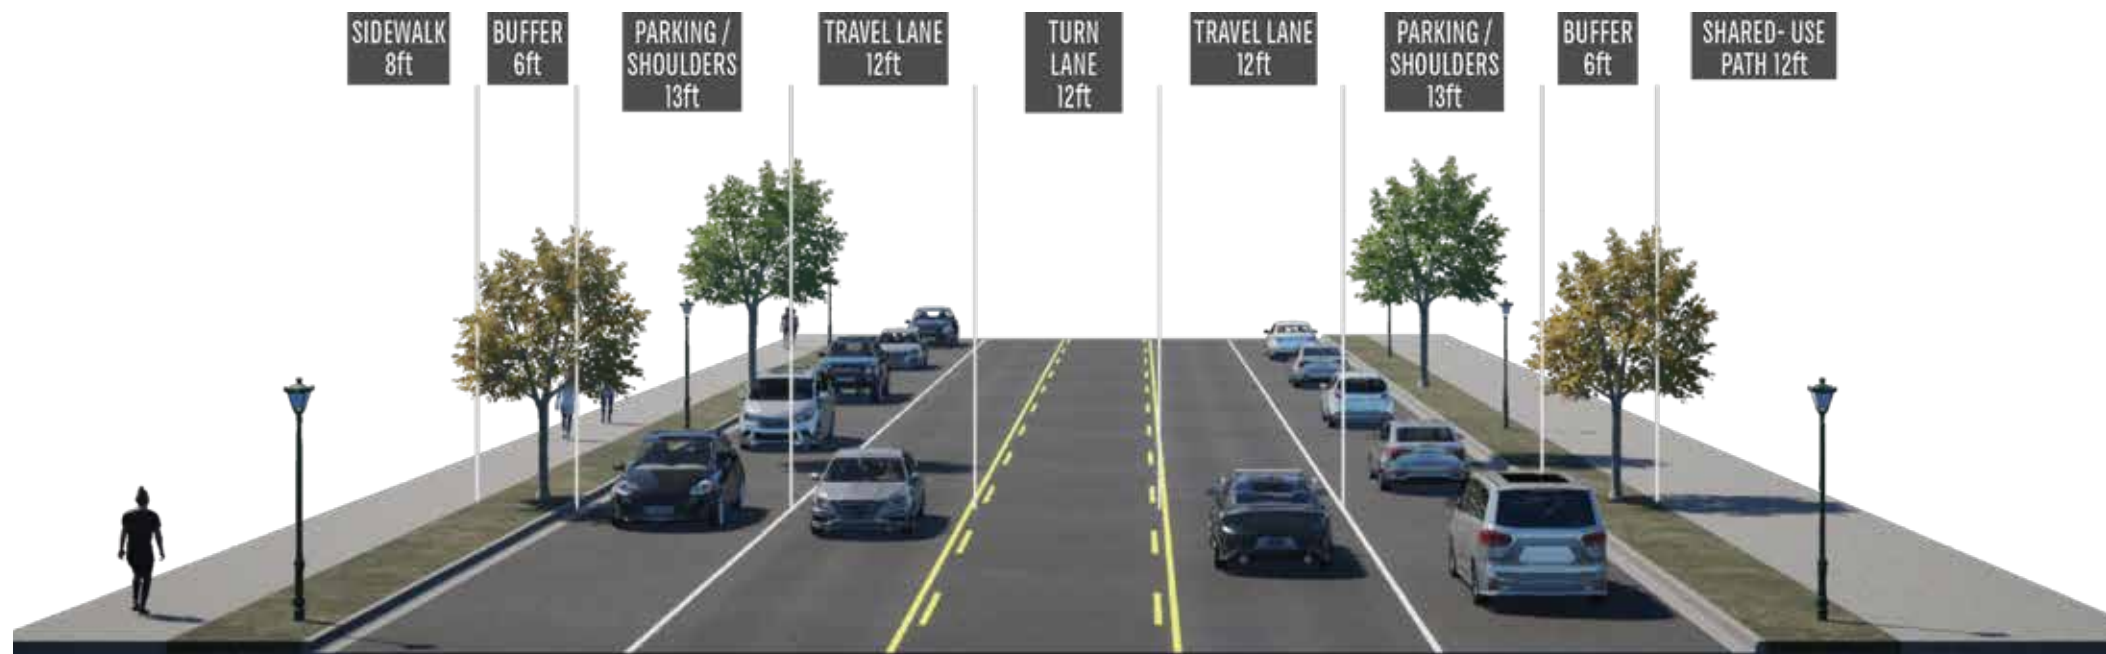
North of TRAX Station- 700 E Proposed Street Section, looking north
